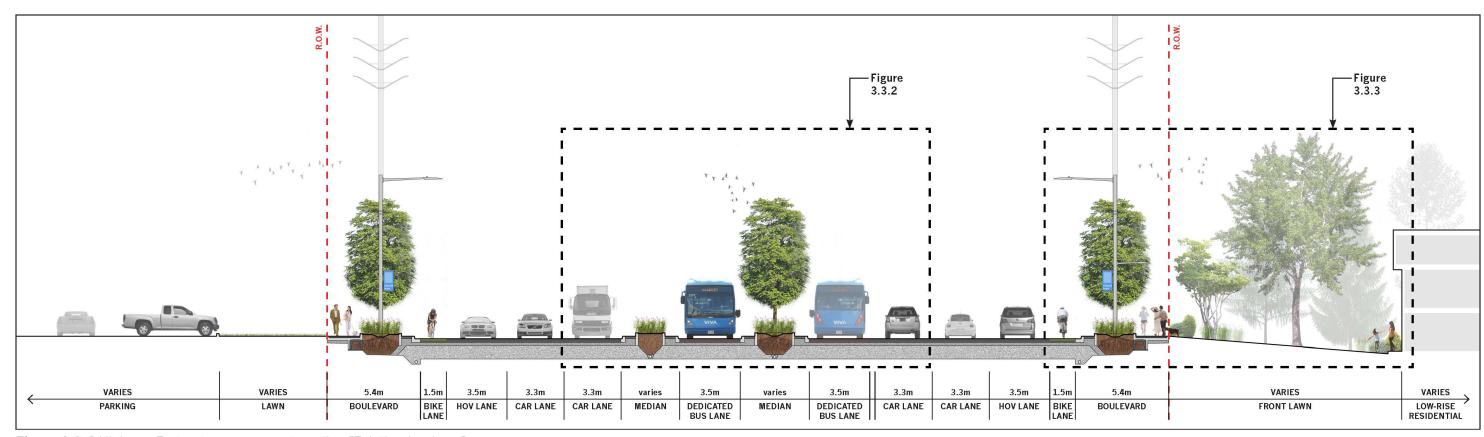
Highway 7 streetscape concept section [Existing land use].
